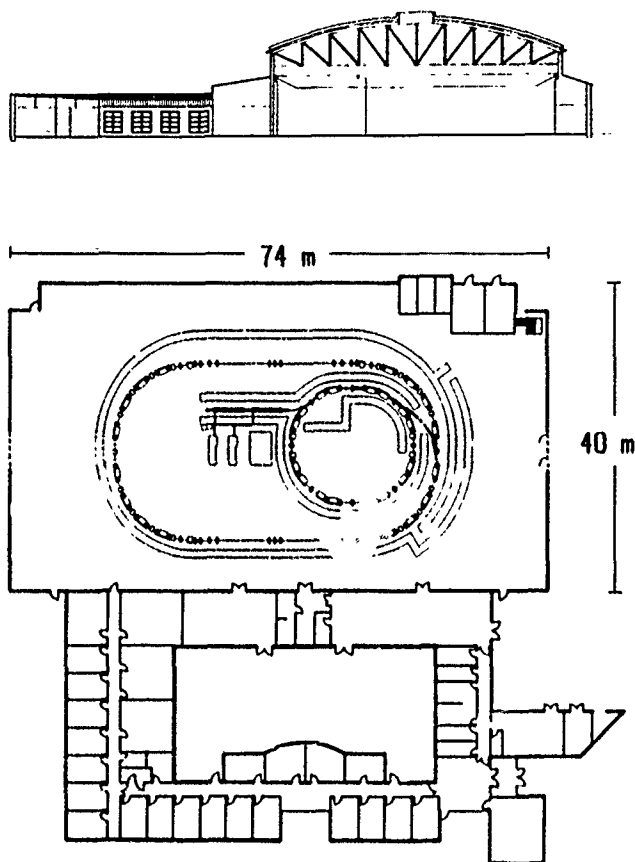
Floor plan of the DELTA facility with the accelerator hall, workshops and offices (lower part) and cross-section of the building (above).
